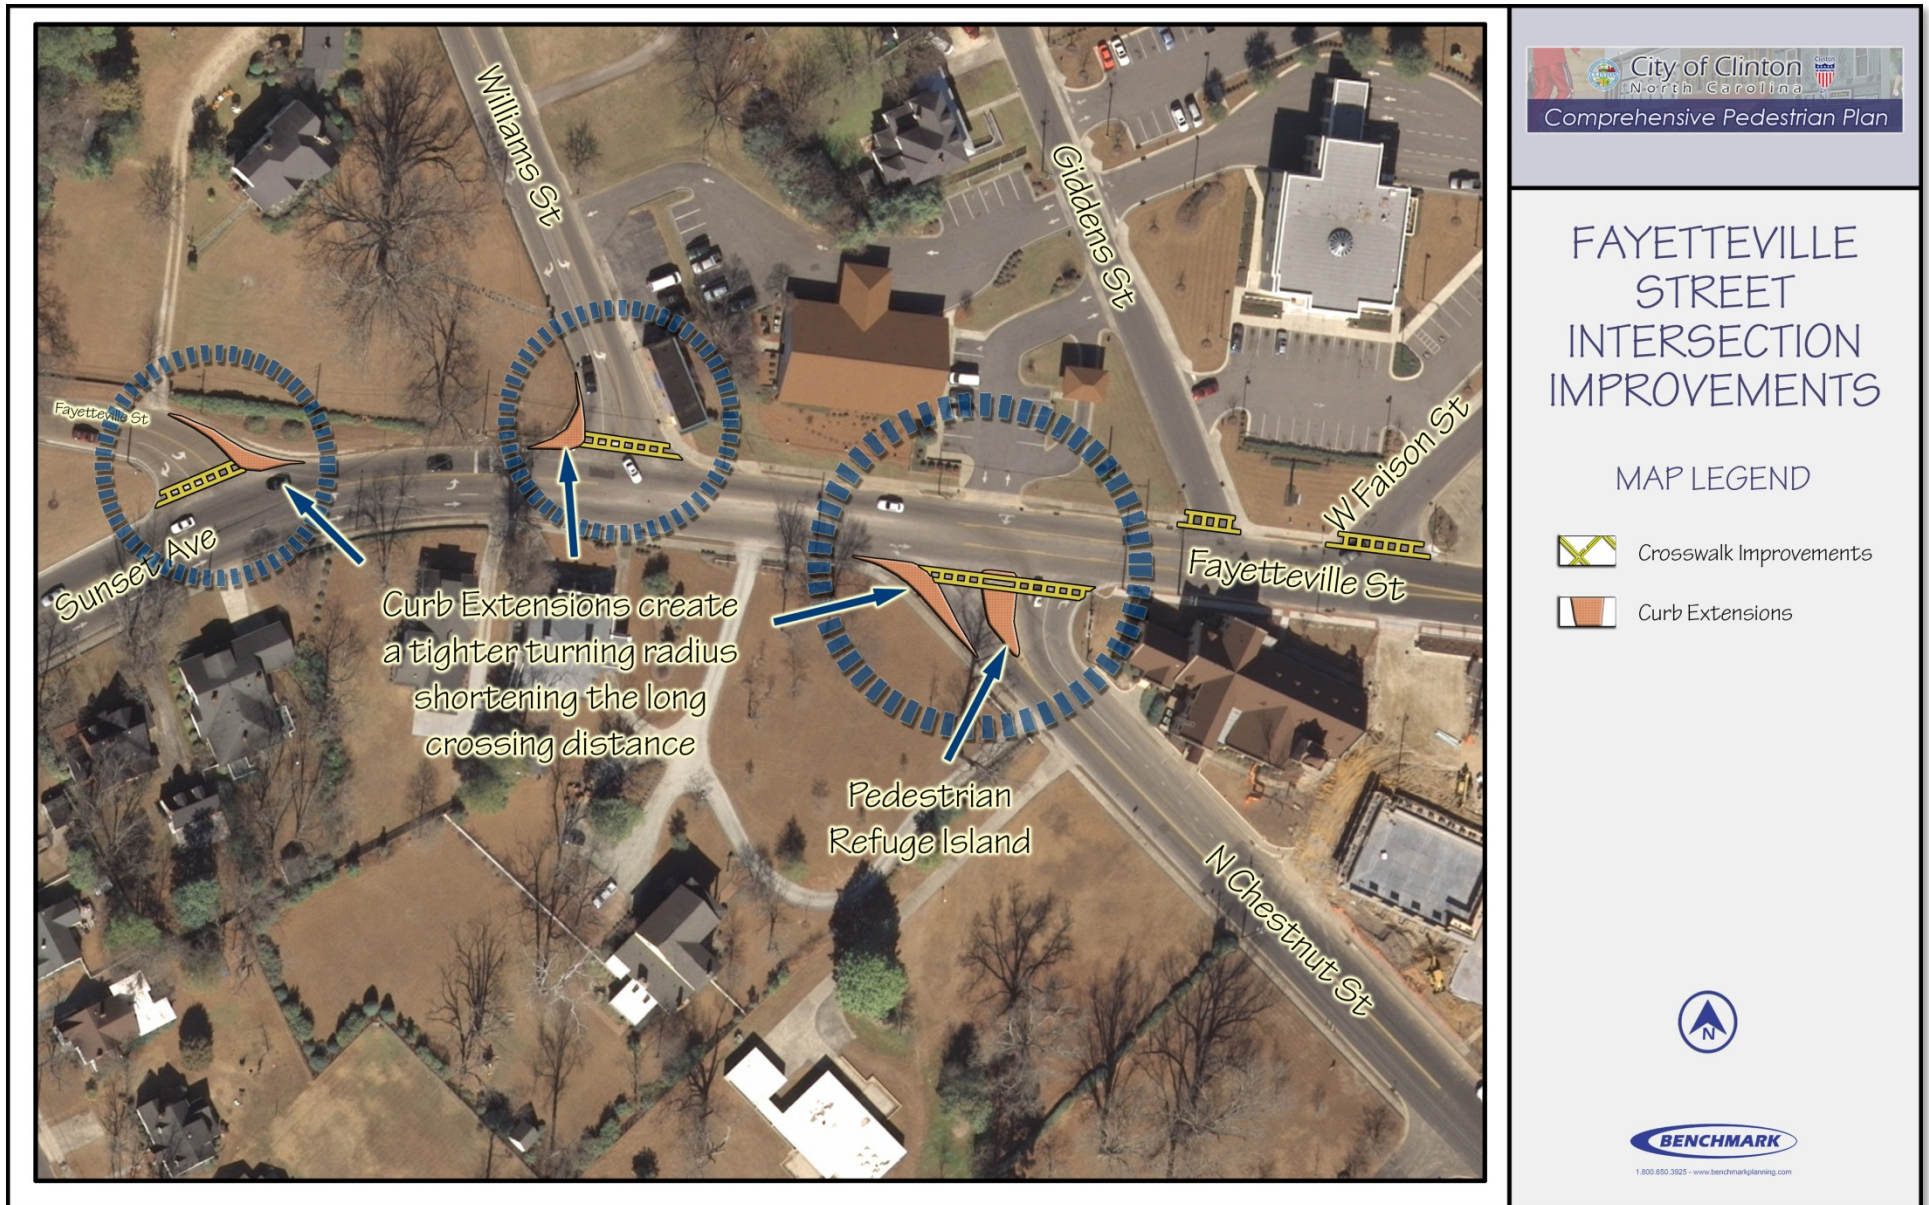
Recommended Intersection Improvements from the Pedestrian Plan.
